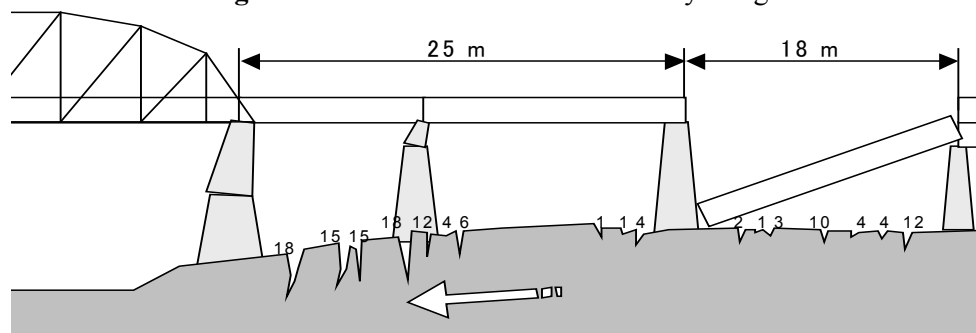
Sketch of toppled span and cracked piers caused by lateral spreading.
